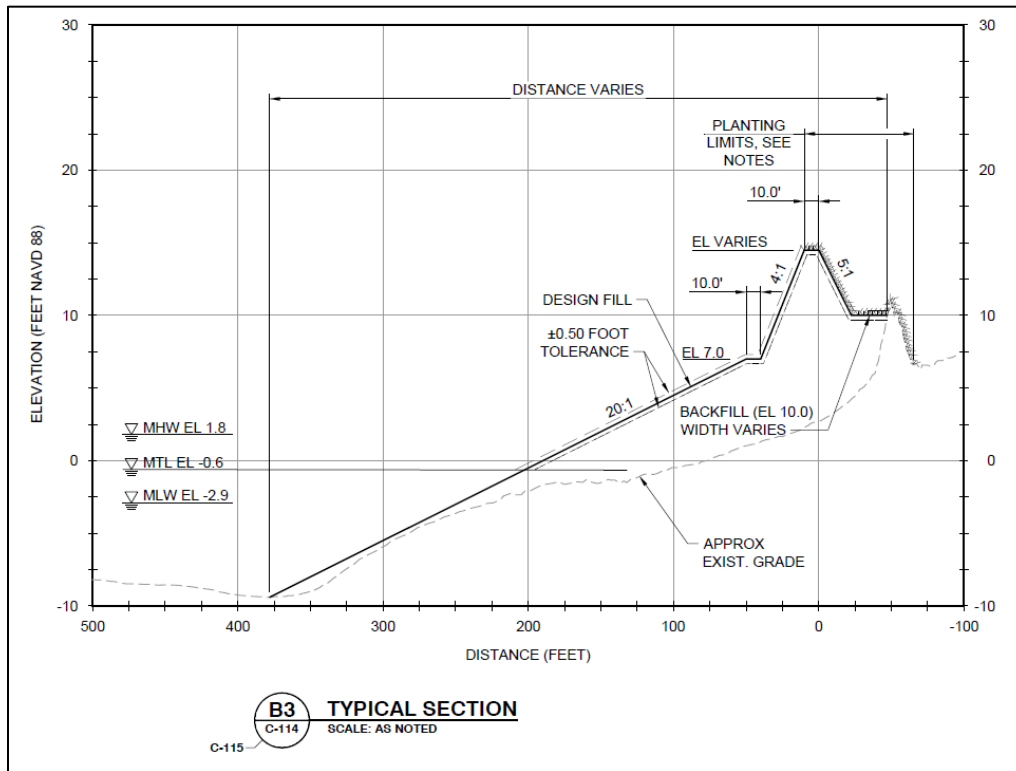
Beach Fill Typical Cross Section – With Berm
